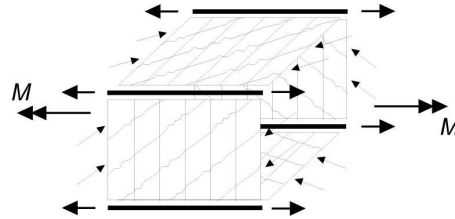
SPANCAD can also be used for torsion in box girder beams
